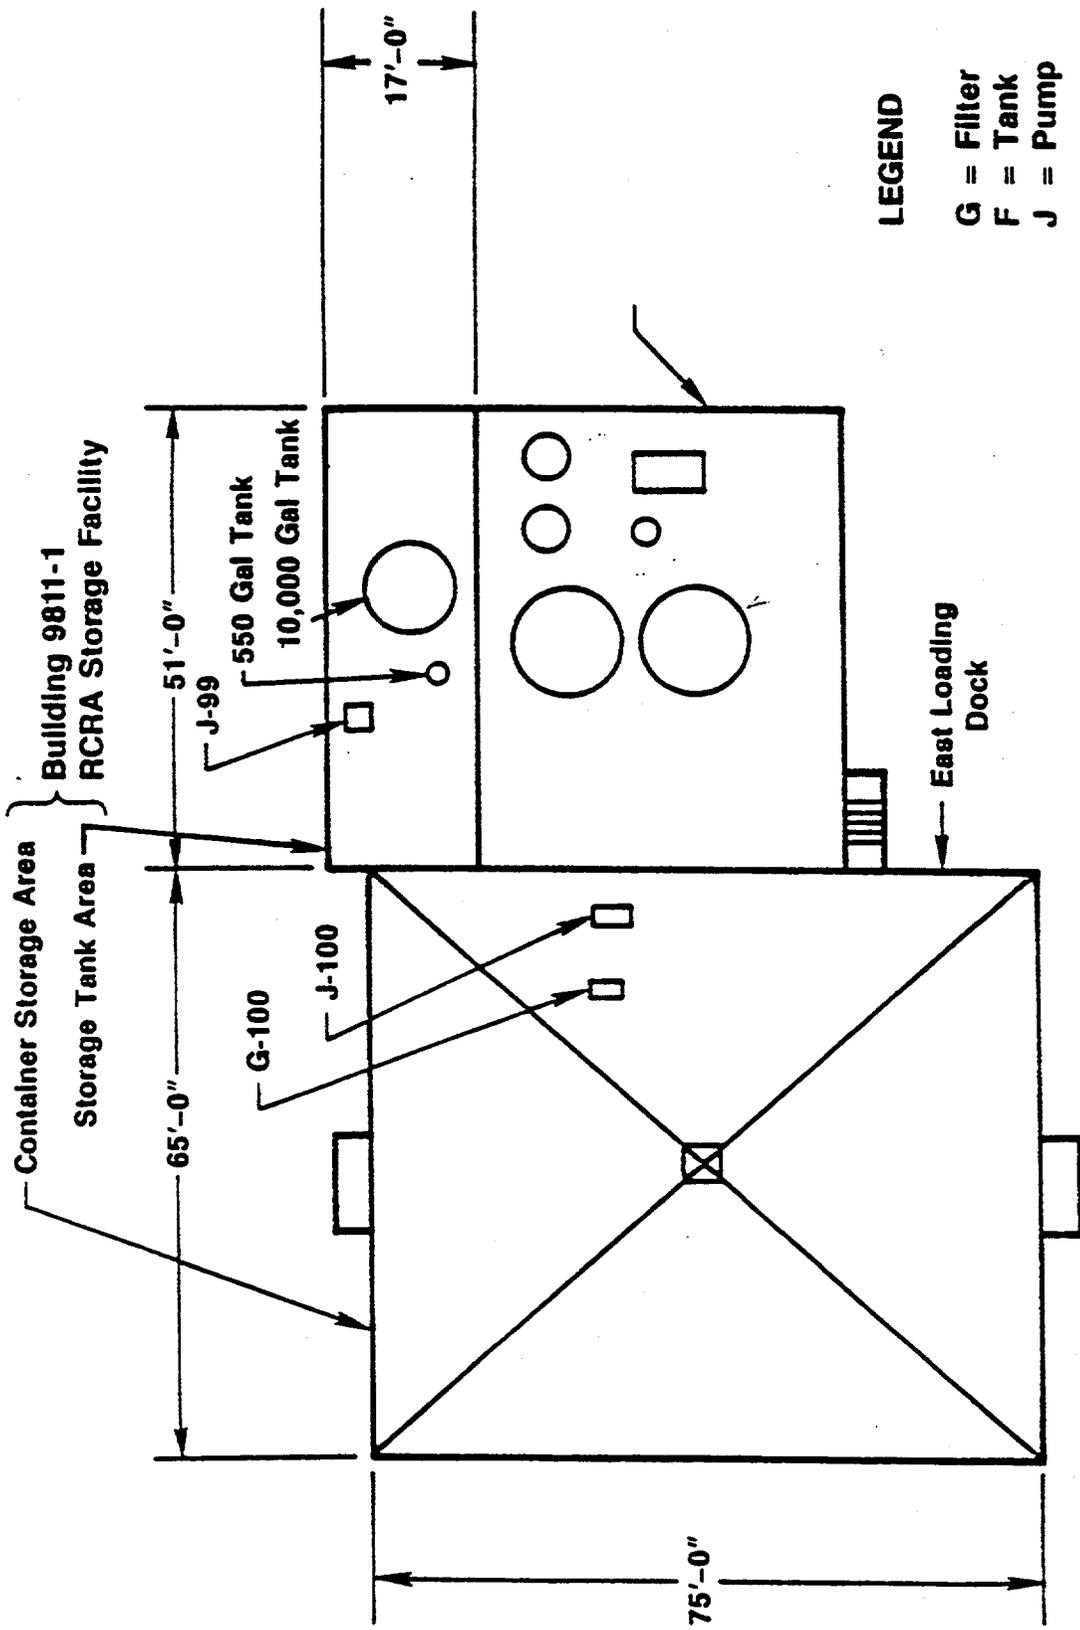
PLAN VIEW OF BUILDING 9811-1 RCRA STORAGE FACILITY.
